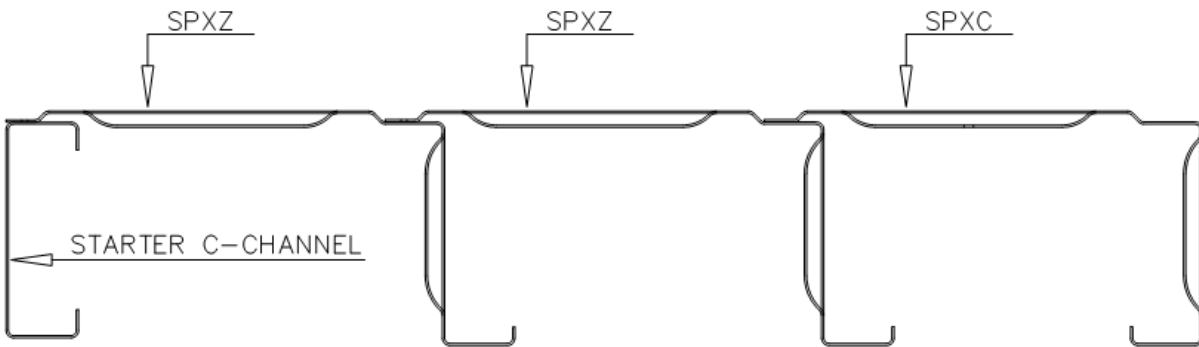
SPX structural panel components in floor, roof, and deck applications.
